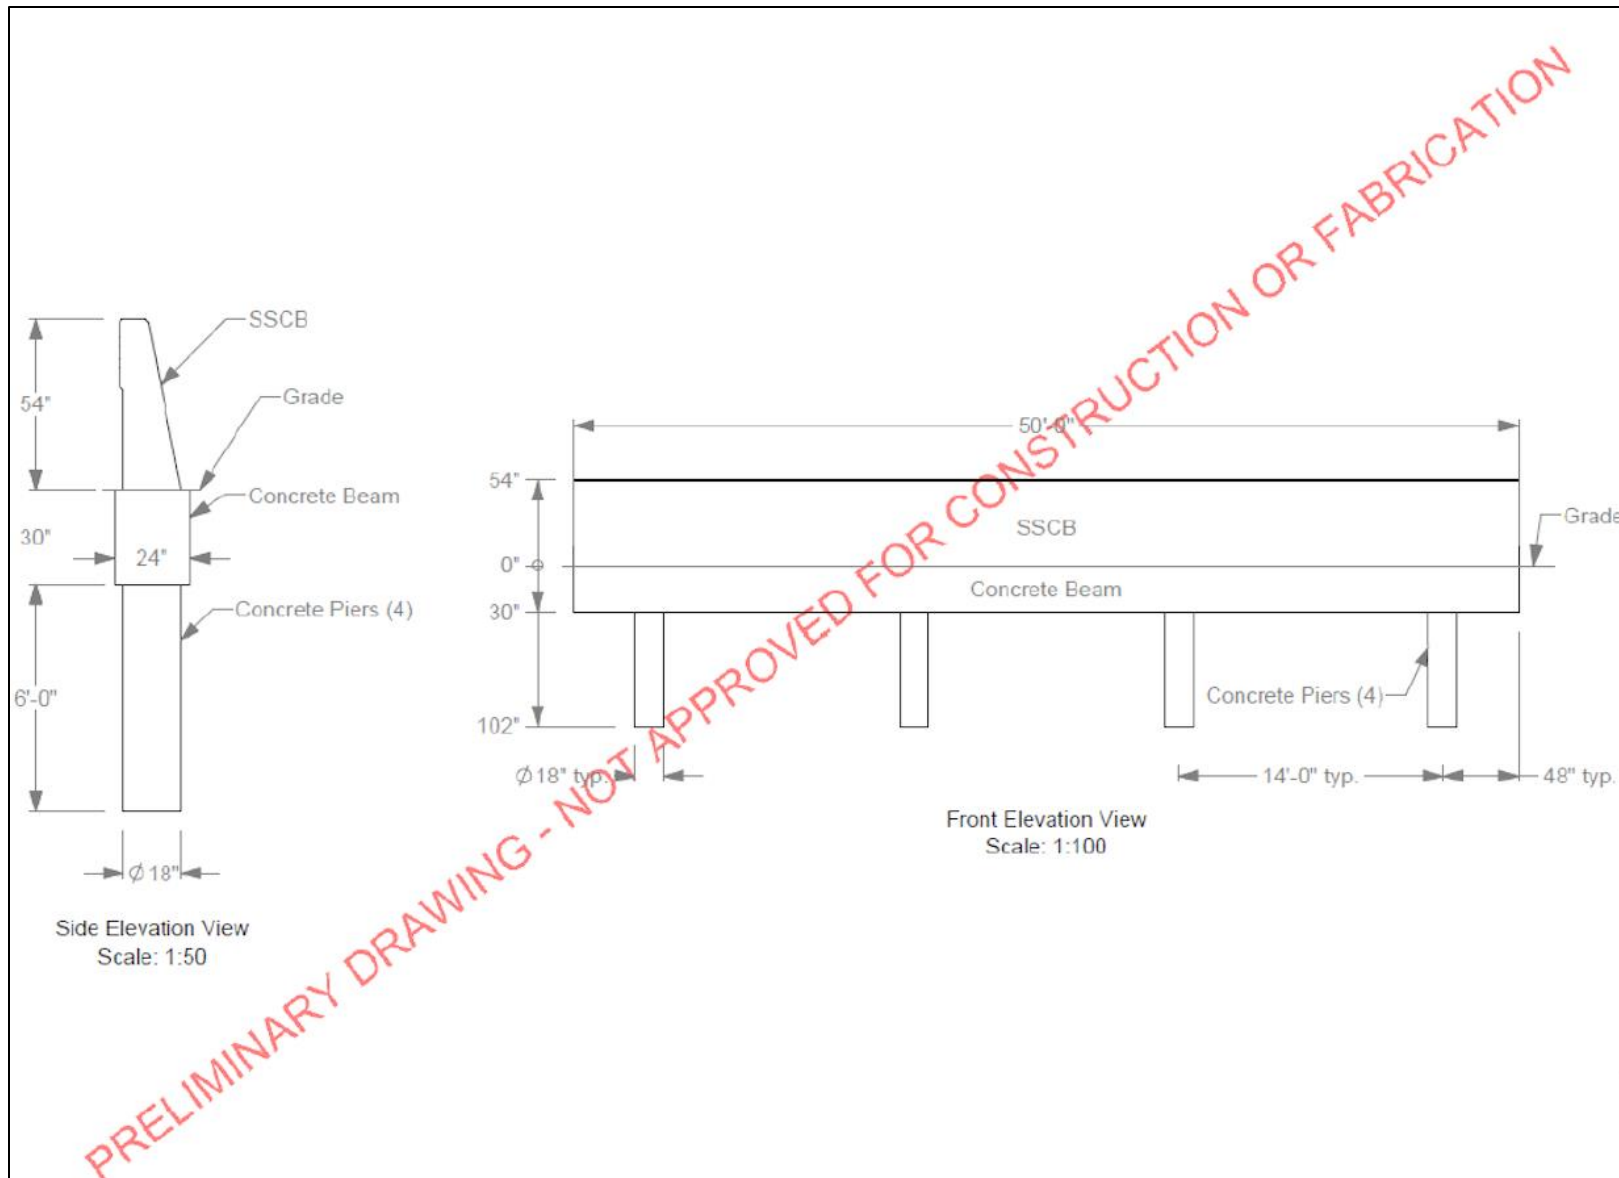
Design Concept 3 – Hybrid of Drilled Shaft and Concrete Beam Foundations (TTI, 2017)
